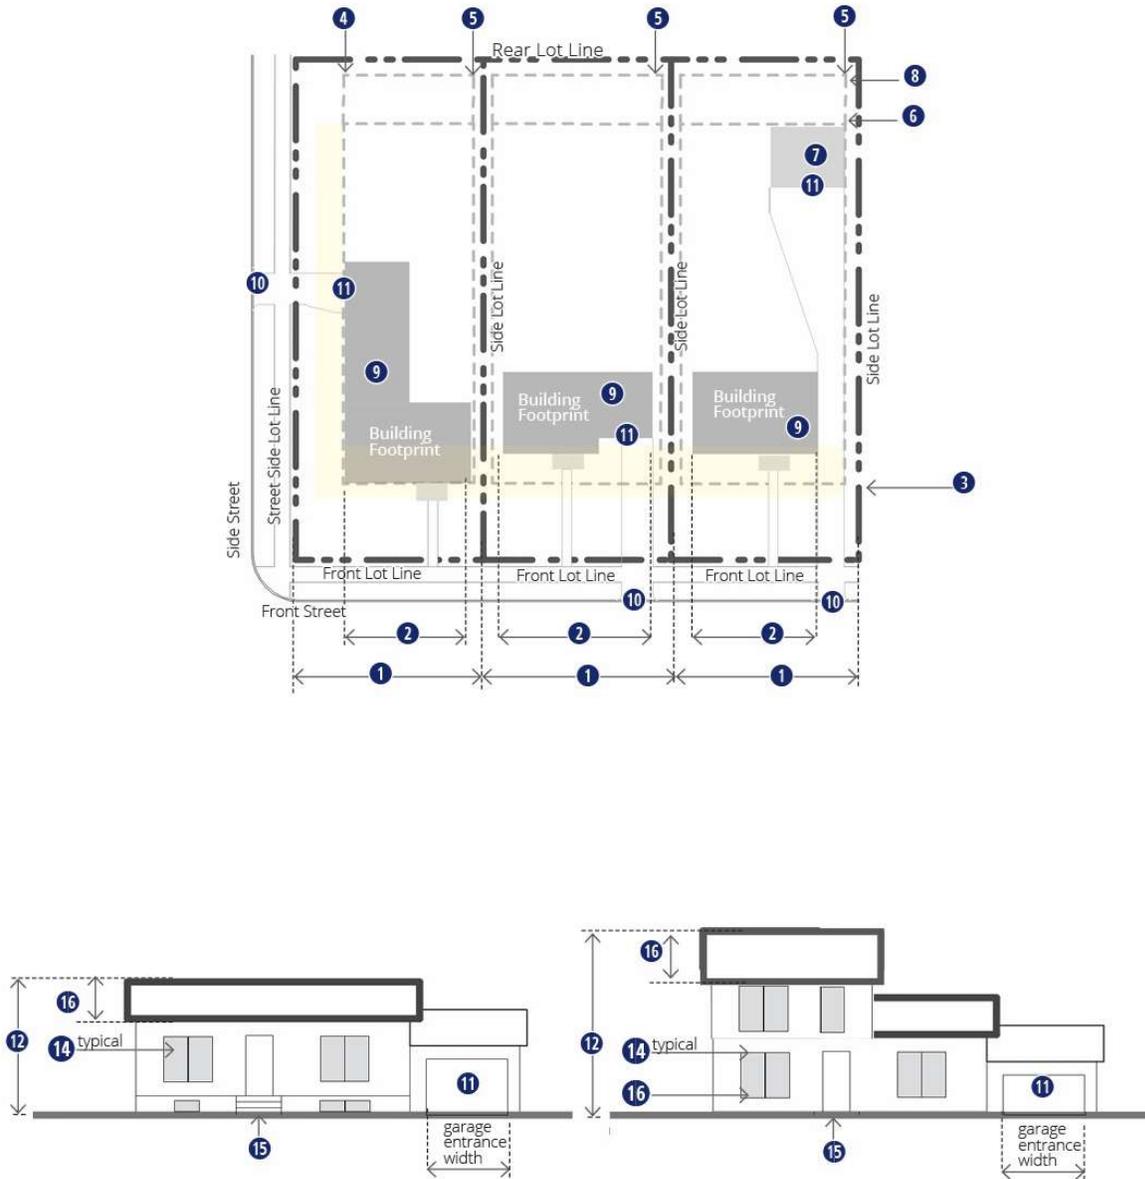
(6). N2 district diagrammatic plans and elevations.
